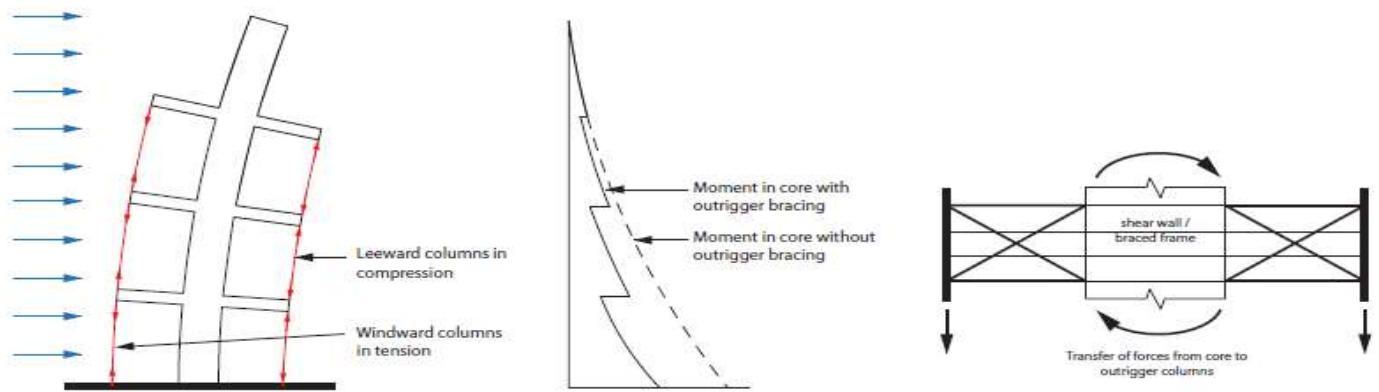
Behaviour of Outrigger Structural system (Retrieved from - CTBUH Technical Guide)
